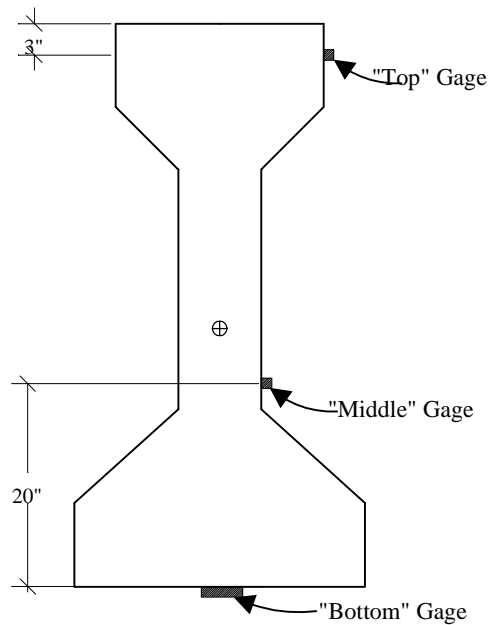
Cross Section of the Type IV Girder with the Three Strain-Gage Locations
